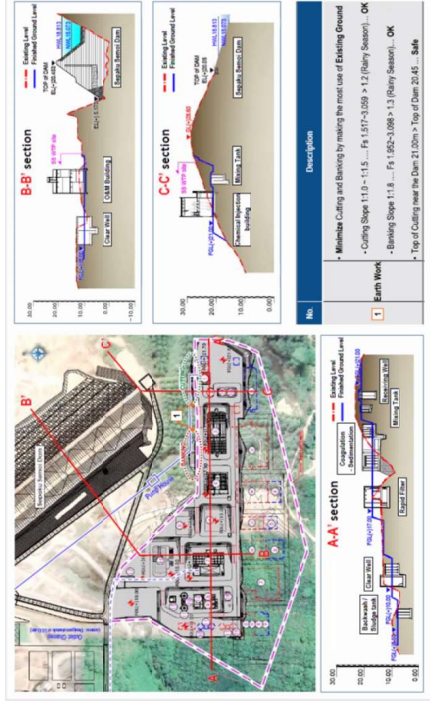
Layout of WTP Plan and Deductions A-A', B-B' and C-C'
